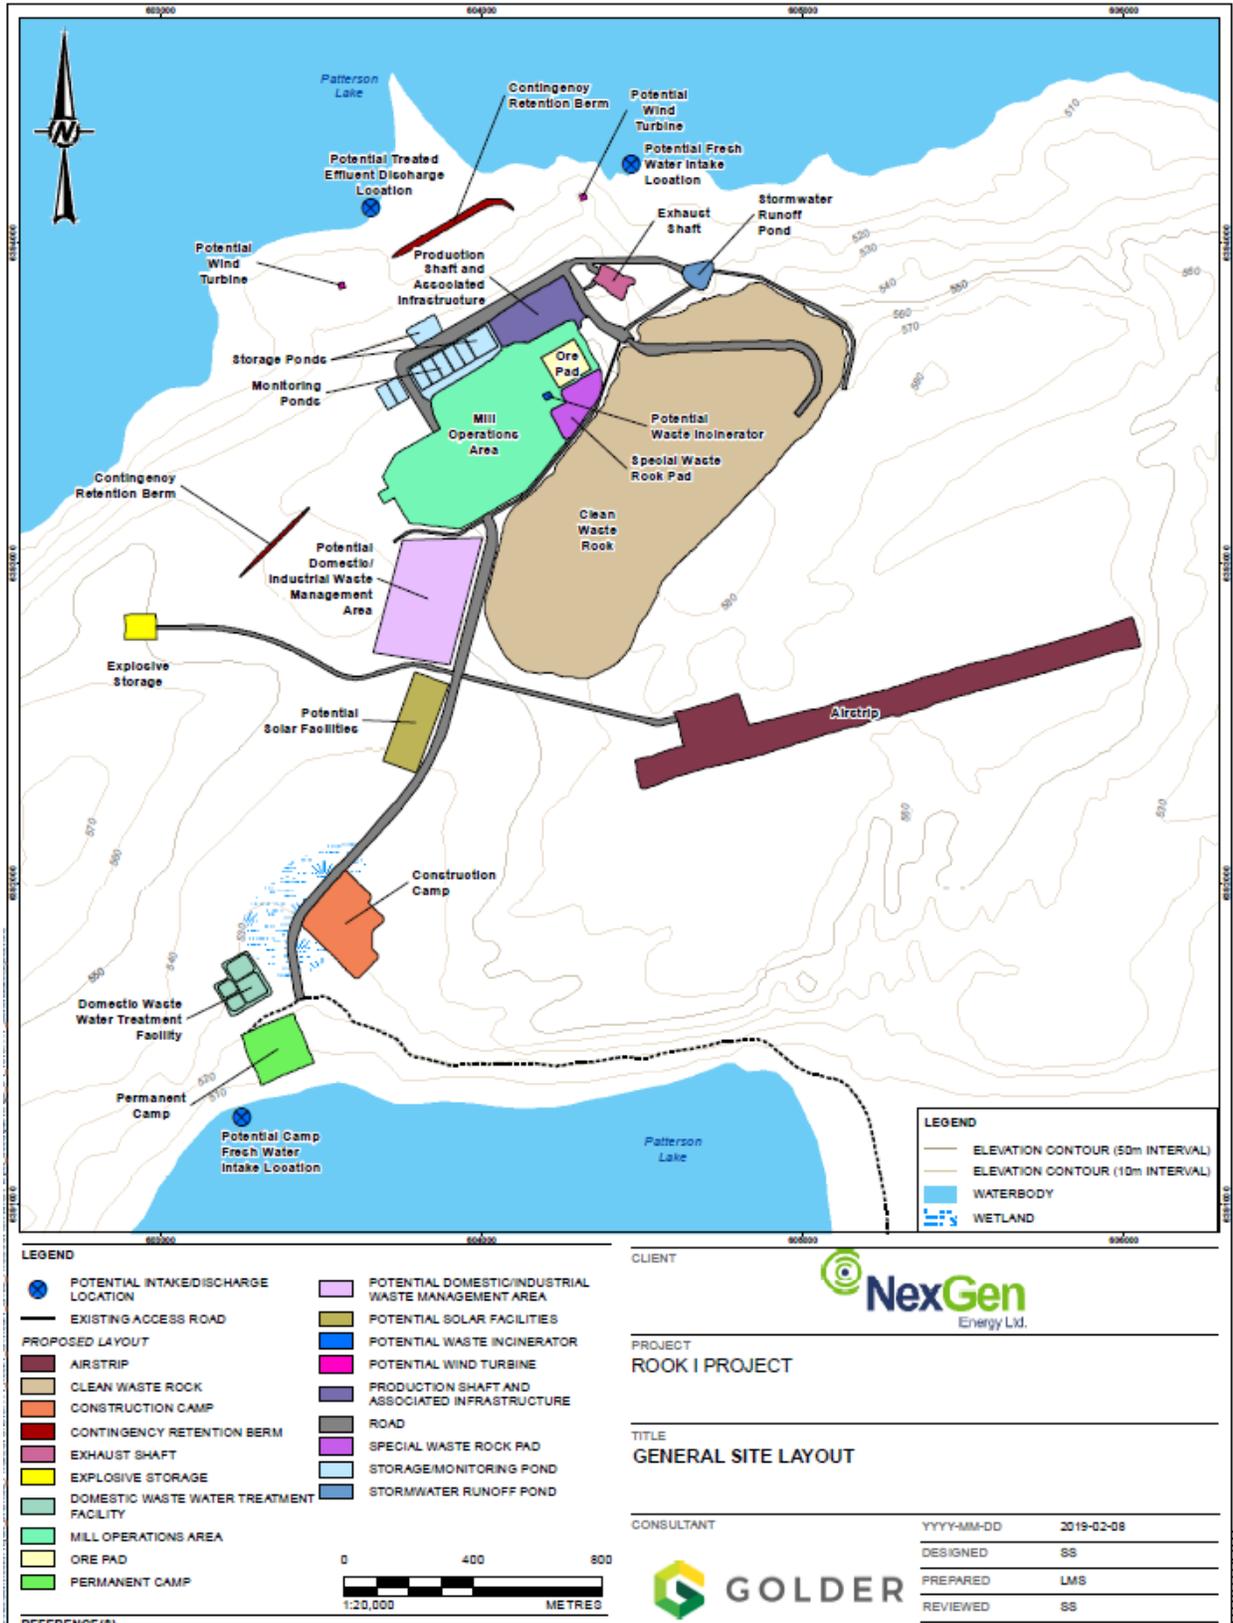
Site Layout of the Rook 1 Project, from EIS Figure 2.3-1 (NexGen, 2022)
